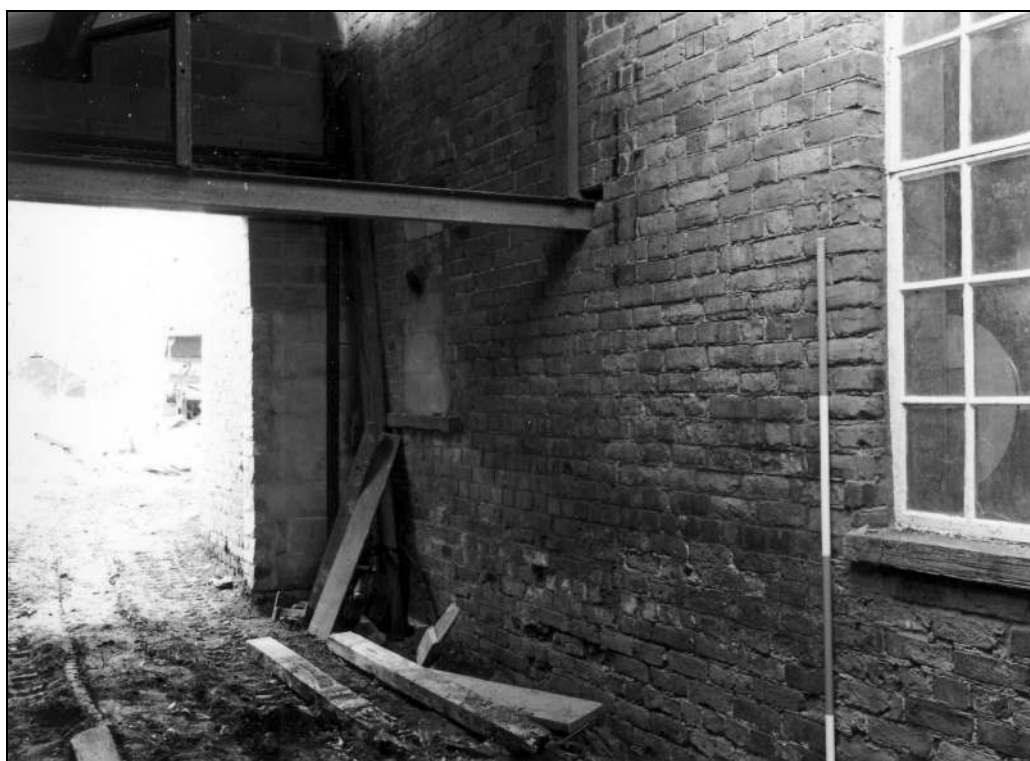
The retort house: north-west elevation (film 3, frame 1)
